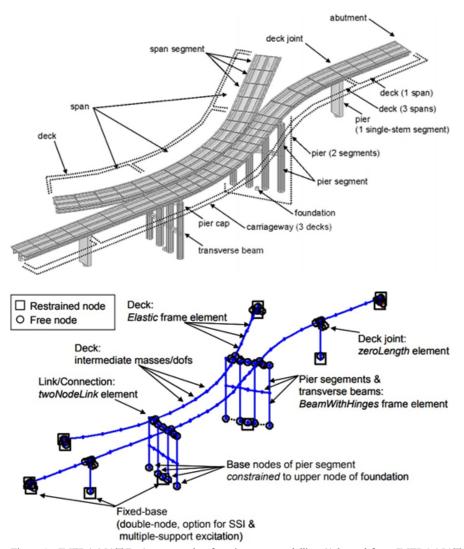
INFRA-NAT Project example of carriegeway modelling (Adopted from INFRA-NAT Project, "D3.2 - Portfolio of bridge typology numerical models and fragility functions")
